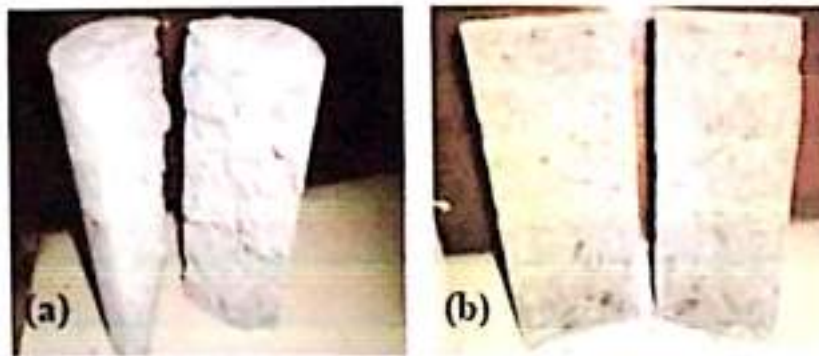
(a) Failure form of splitting tensile force at concrete cylinder made of new cement; and (b) failure form of splitting tensile force at concrete cylinder made of Portland cement.
